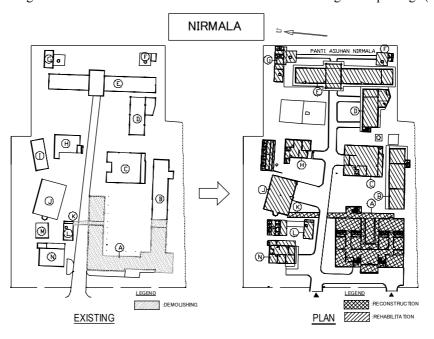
Site Plan and Rehabilitation Plan for Nirmala Orphanage
